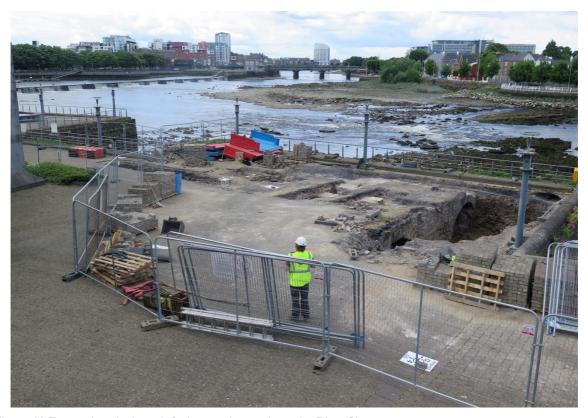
Excavations in Area 1, facing southwest down the River Shannon
